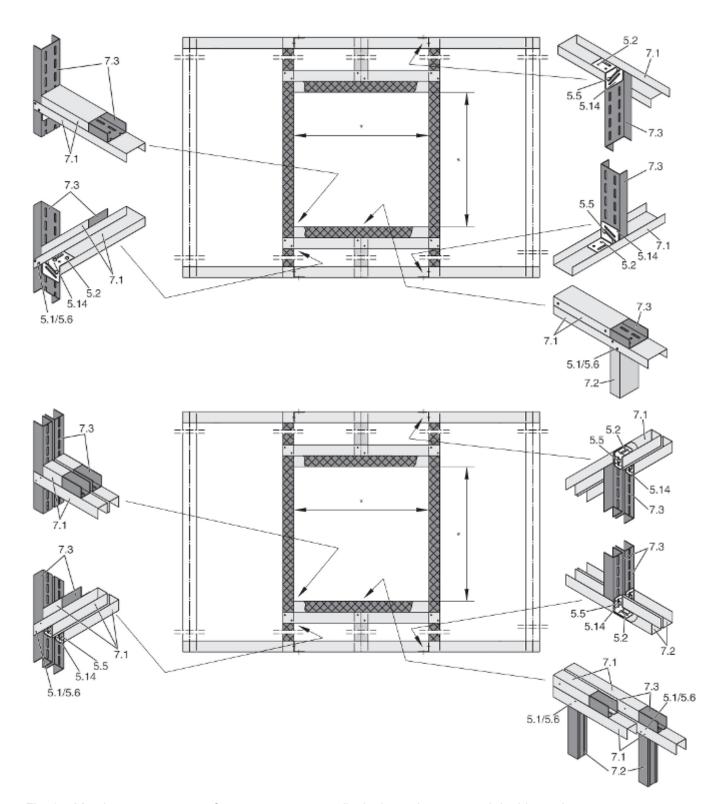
Metal support structure for a compartment wall, single stud system and double stud system
